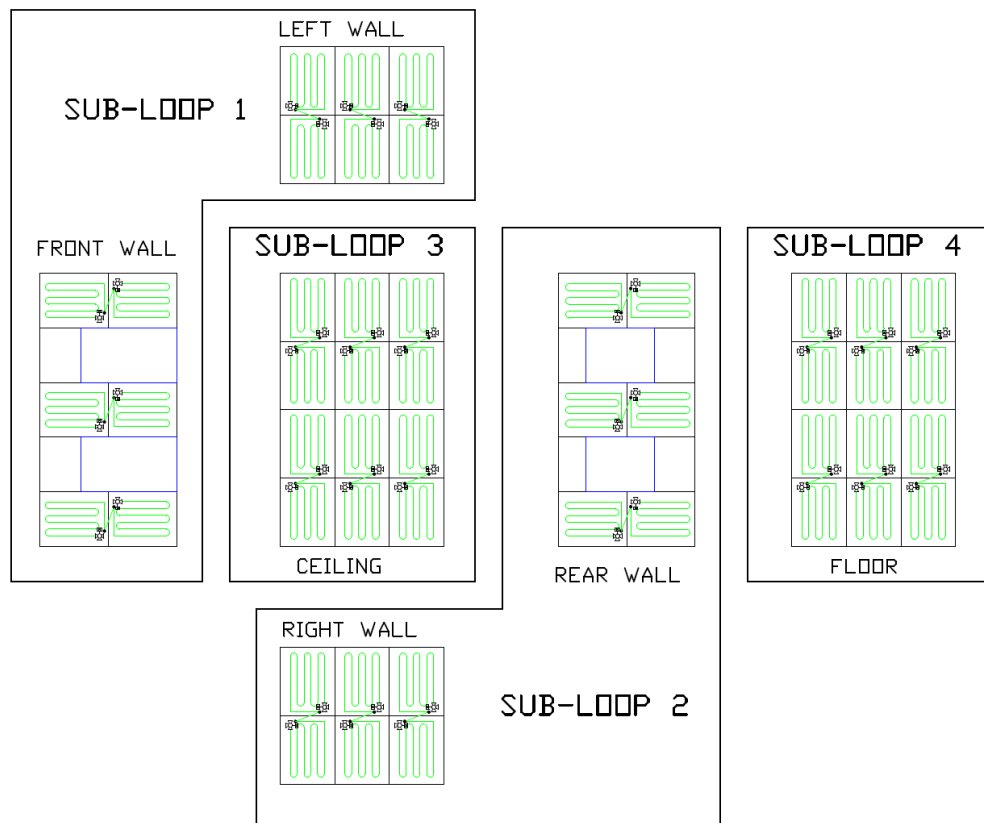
HBIL plumbing layout - 4 sub-loops
